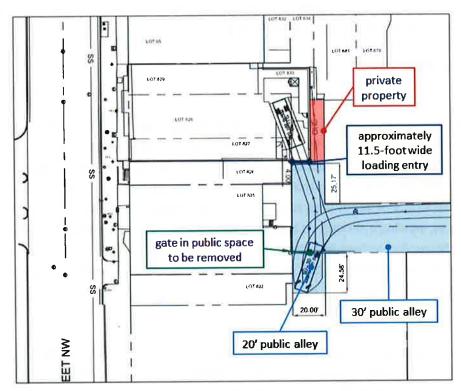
Loading Movements and Alley Access (Source: Dewberry, Exhibit 9A1, provided by the Applicant on 1.29.18)
